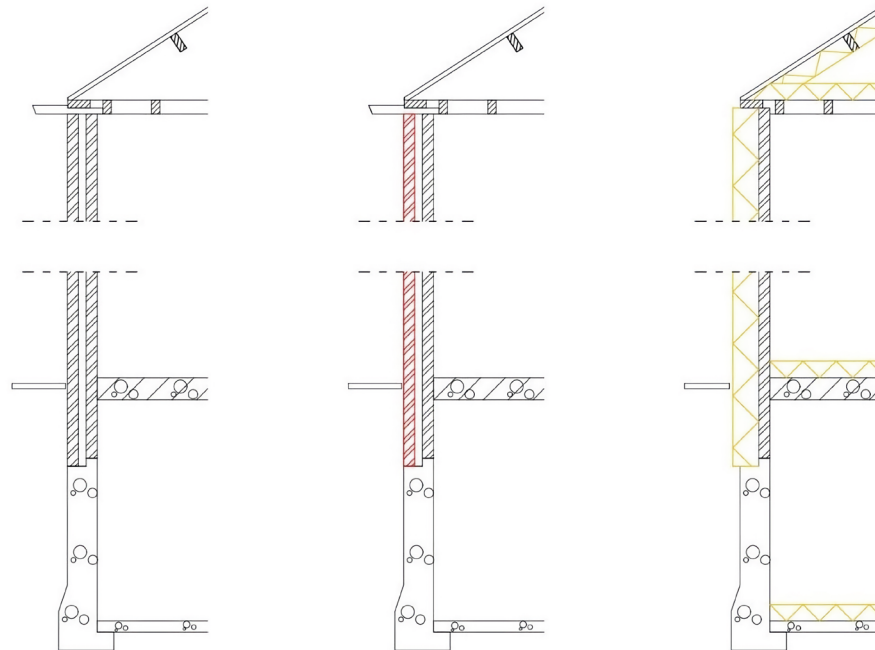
Insulation addition and structure of renovated wall (existing façade in grey, the brick layer to be demolished in red, and the new insulation addition in yellow)
